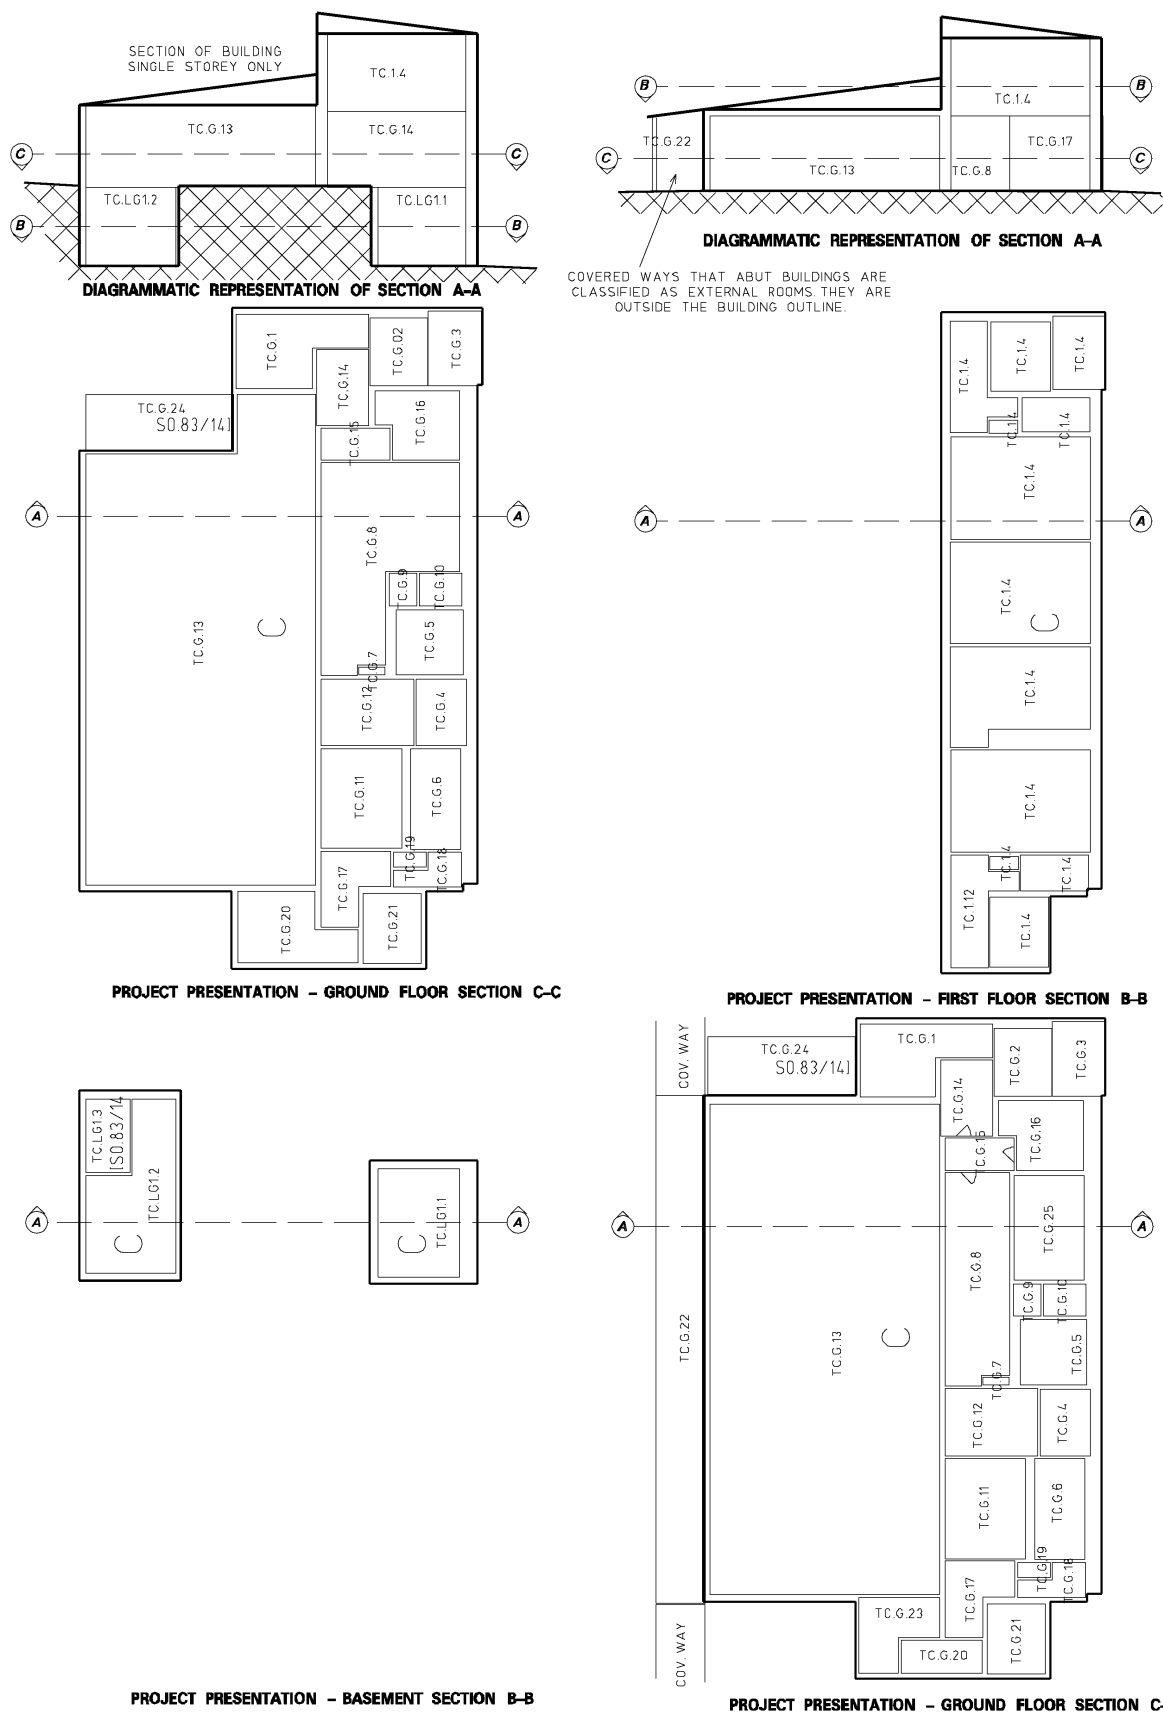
Example drawing of spaces within building outline on sloped site with split levels
